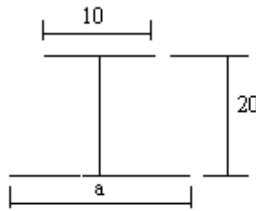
Cross section with varying bottom flange width (Dimensions in mm)
